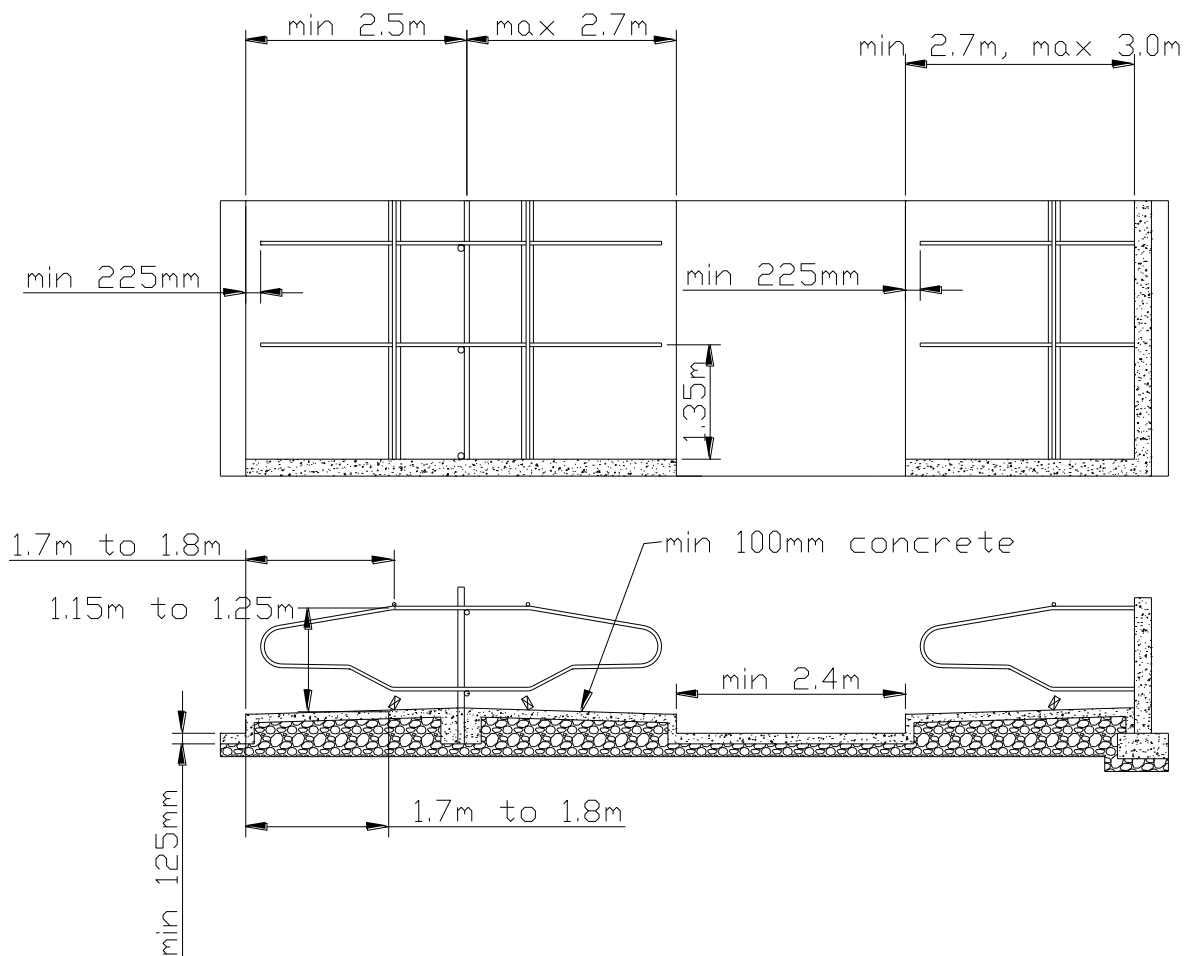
Minimum and maximum dimensions for cubicle bed and divider layout.
